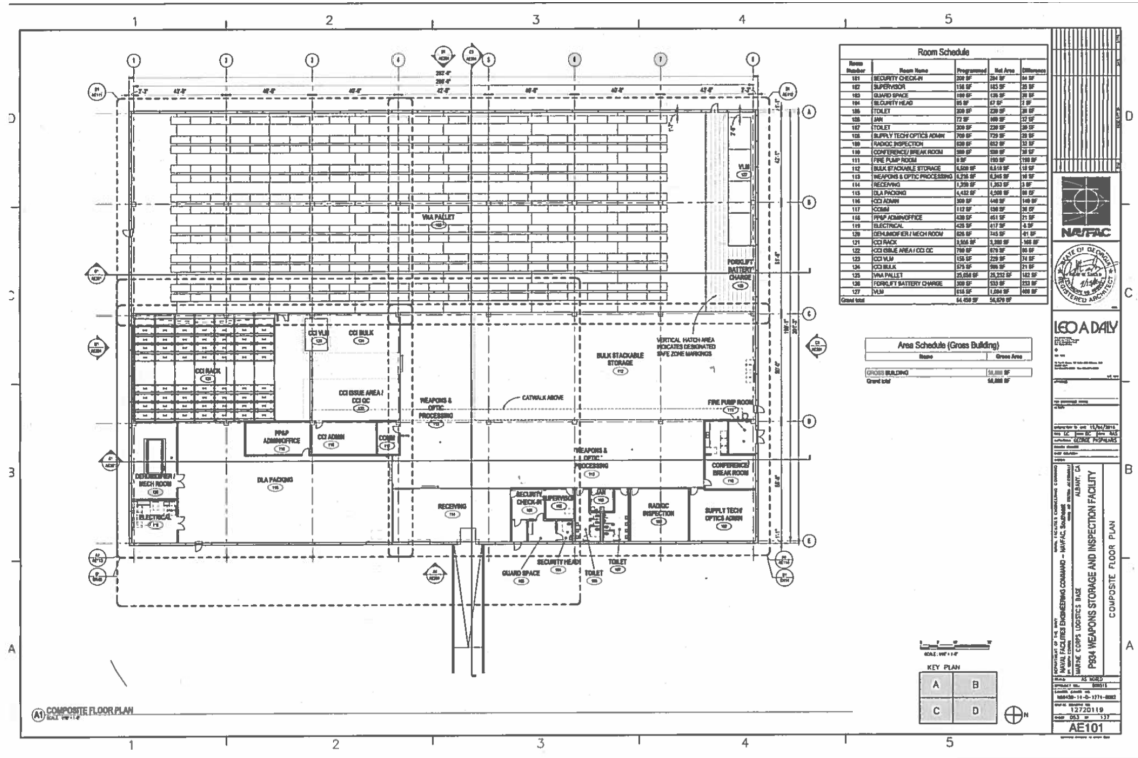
Wilson Warehouse floorplan. Source: Daniels (2018).
